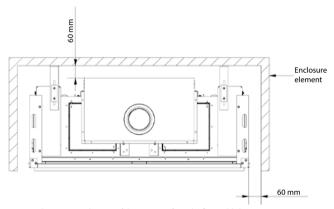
The minimum distance of the gas insert from the flammable housing components.
